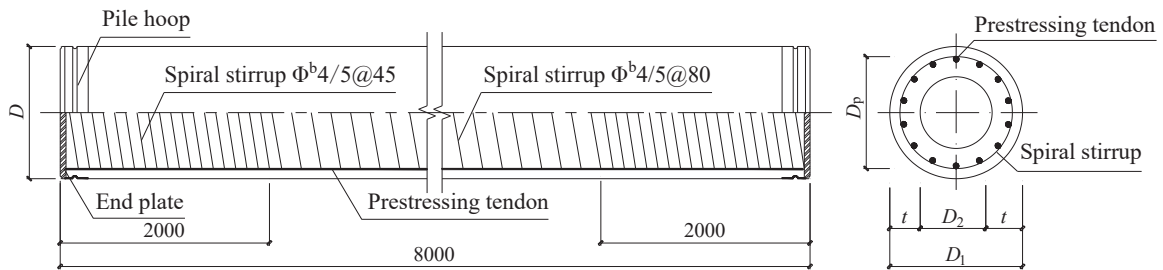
Schematic diagram of reinforcements in test specimens (Unit: mm)
